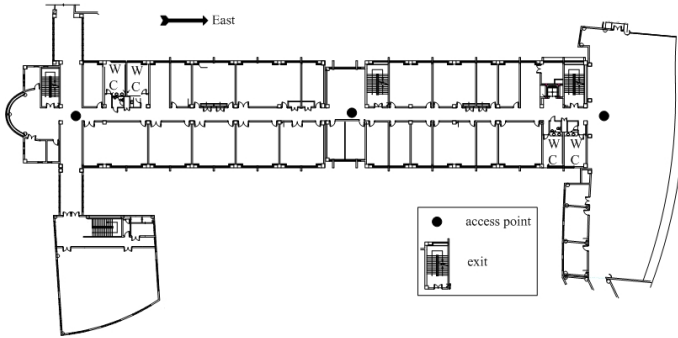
The layout of the second floor of the third building of the Electronic Information and Electrical Engineering School buildings
